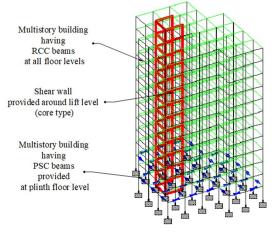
Model OPSC-BP - General Structure with PSC beam provided and interchanged at plinth floor level
